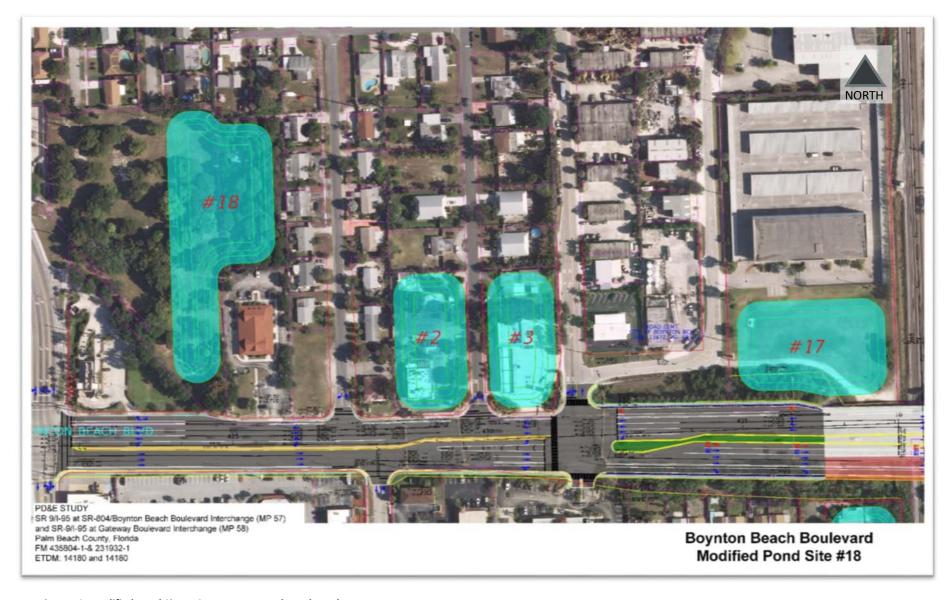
Modified Pond Site #18 – Boynton Beach Boulevard
